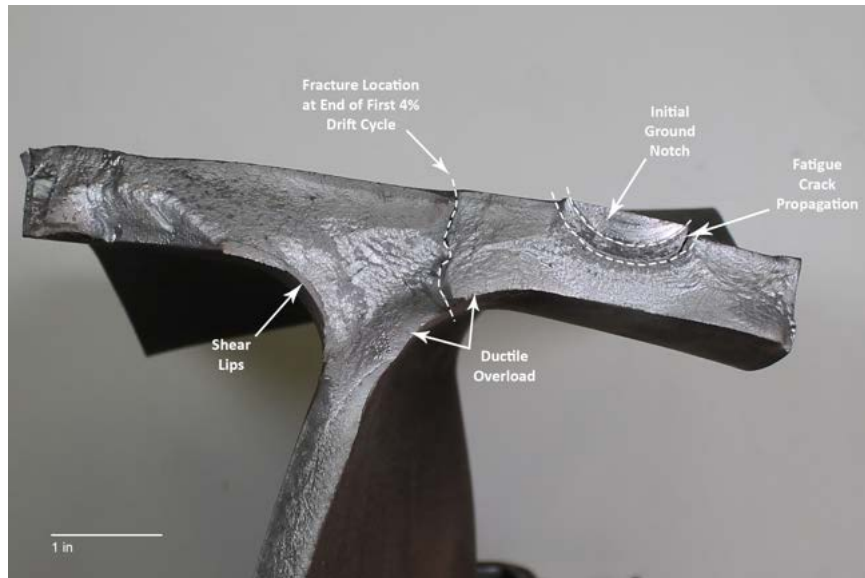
W36RBS-0.25N-T94 top flange fracture looking towards the end-plate.
